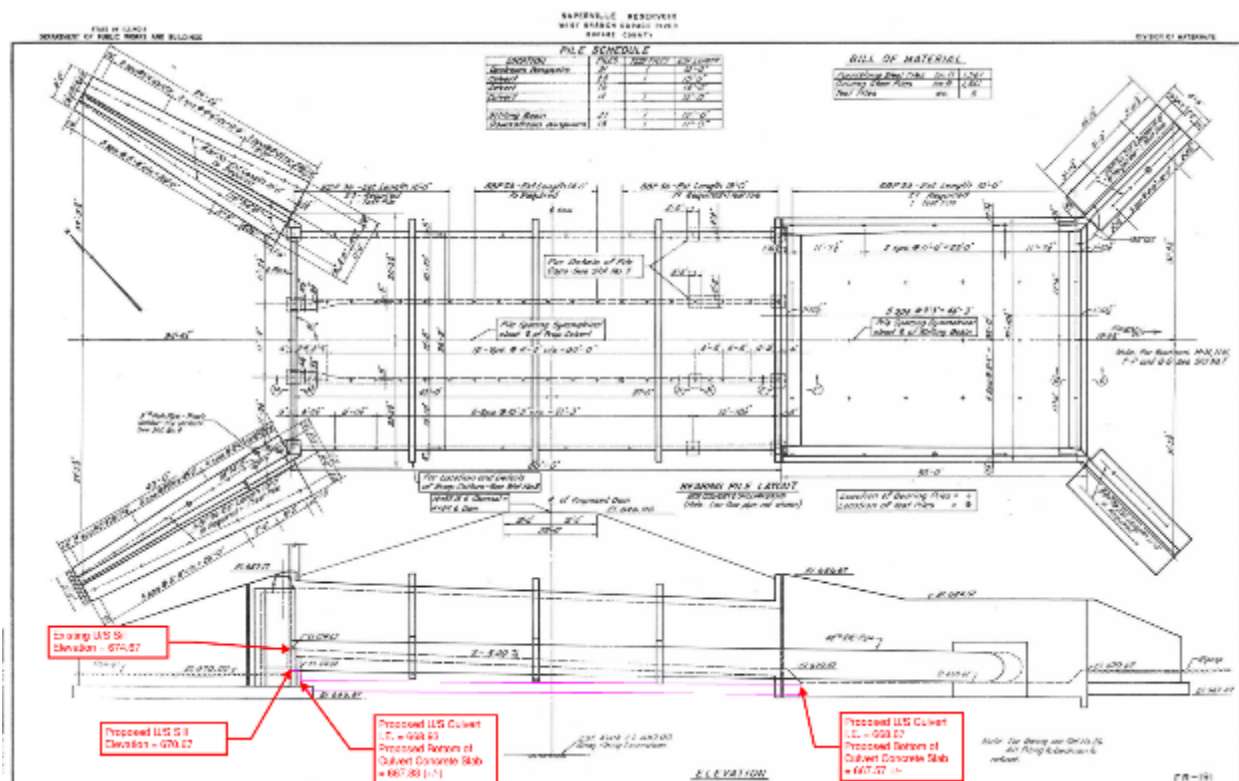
Preliminary Structural Modification Detail cross section for Fawell Dam.
